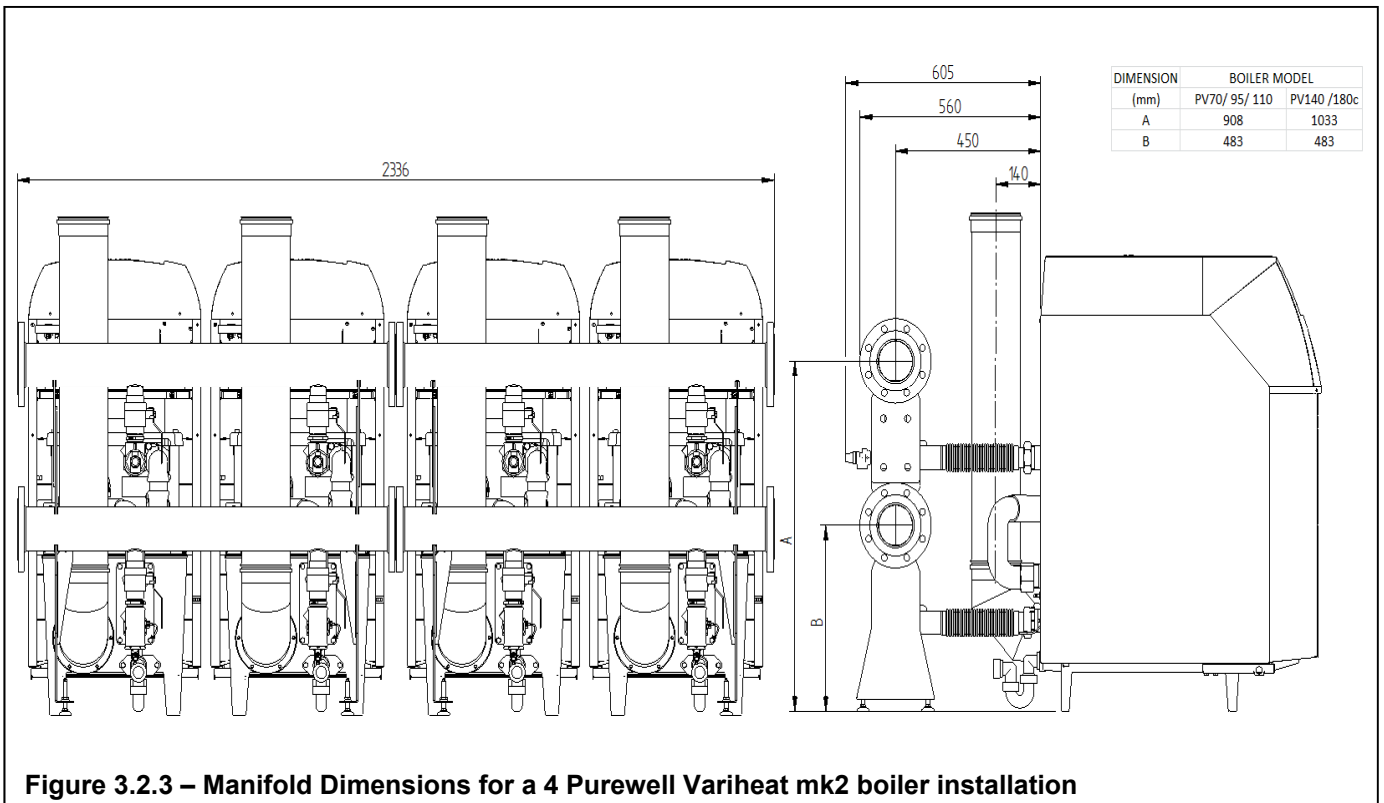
Manifold Dimensions for a 4 Purewell Variheat mk2 boiler installation
